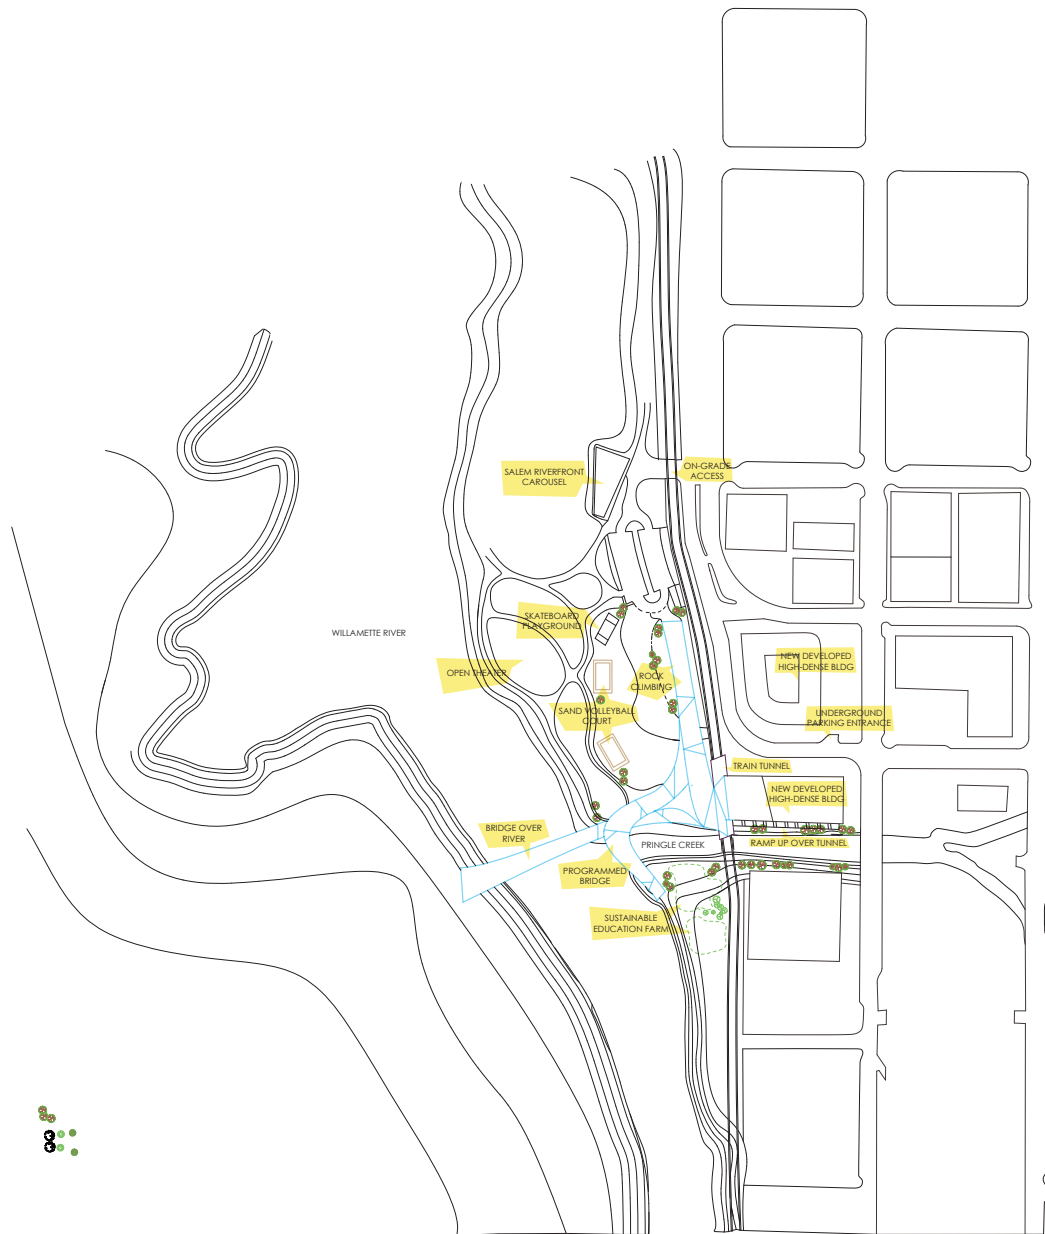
Civic Bridge site plan, Wenyu Jiang.
